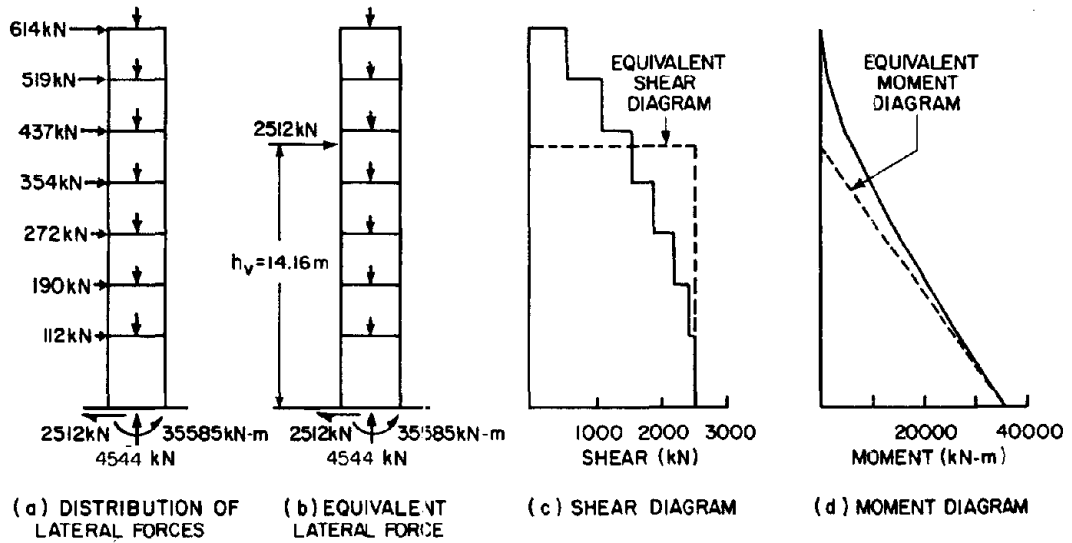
Shear and Moment Diagrams of a Single N-S Wall of Seven-Story Building When Subjected to half of 1.4E and to 1.4 (Torsion) Code Forces
